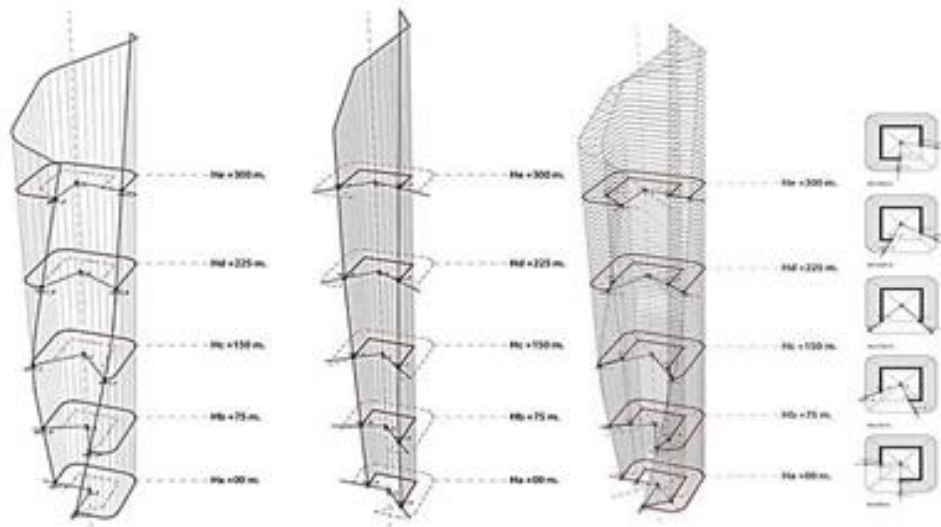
Twisted volumetric and spatial composition of the high-rise complex “Absolute World Towers”: a – twisting of the building's floors;
